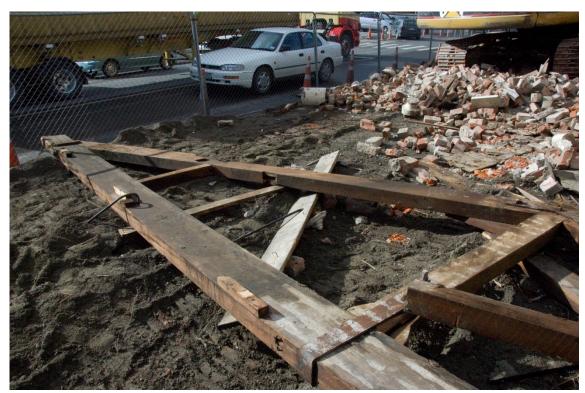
A roof truss, with additional bracing. Note also the staining on the king post, which could be from lath and plaster.
